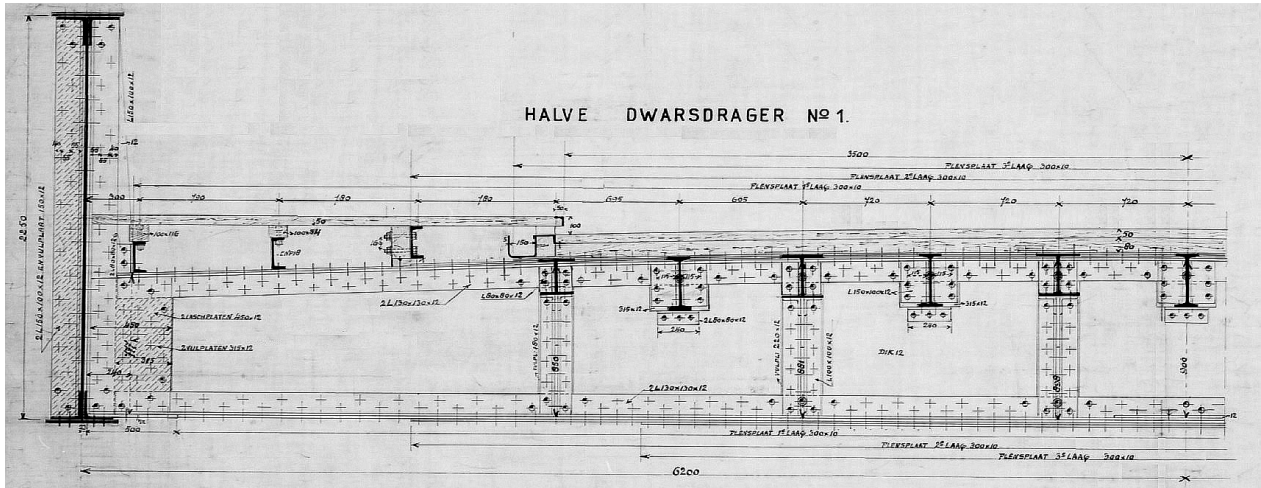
Fraction of an original drawing of the cross girders with H=900mm.
